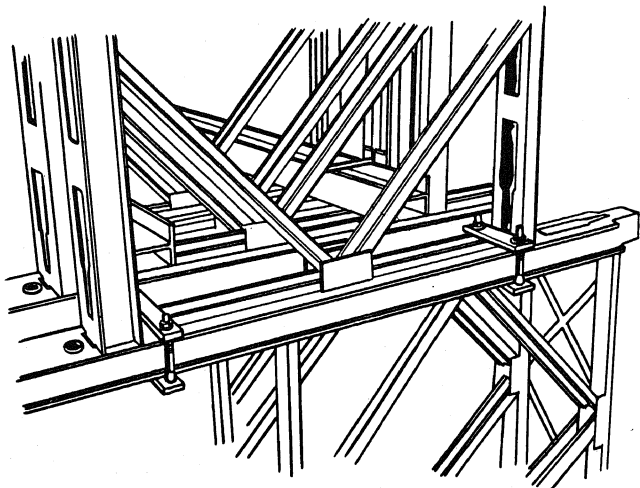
Expedient connection between horizontal and vertical panels in a panel crib pier. Reinforcing plate at the bracing-bolt hole is cut away, and male lugs of vertical panel are slipped between chord channels of the horizontal panel. Panels are tied together by an expedient clamp made from tie plates and rib and bolts.
